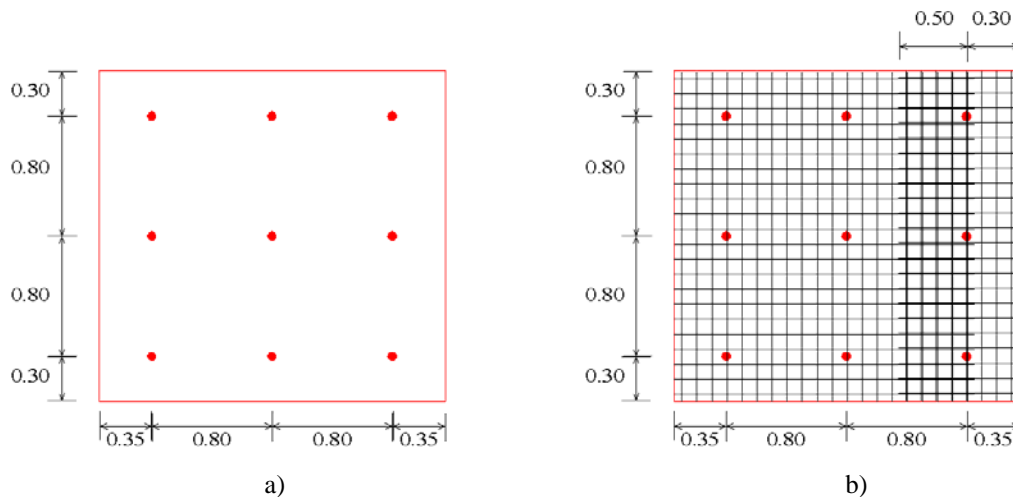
Infill strengthening: a) light connection between masonry and steel mesh (nine connection points); b) reinforcement detailing (lateral overlapping of 0.50 m)
